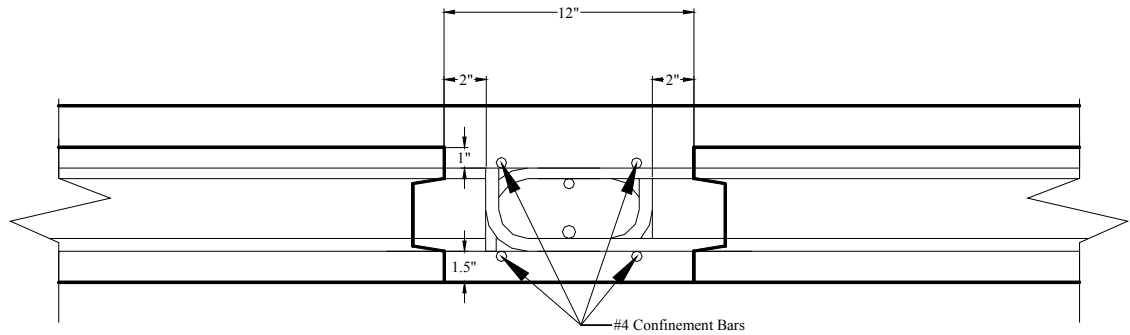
HOOKED BAR CONSTRUCTION DETAILS
